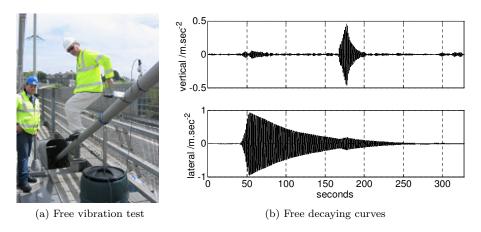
Damper installed at cable 3S under test, showing water-butt damper
